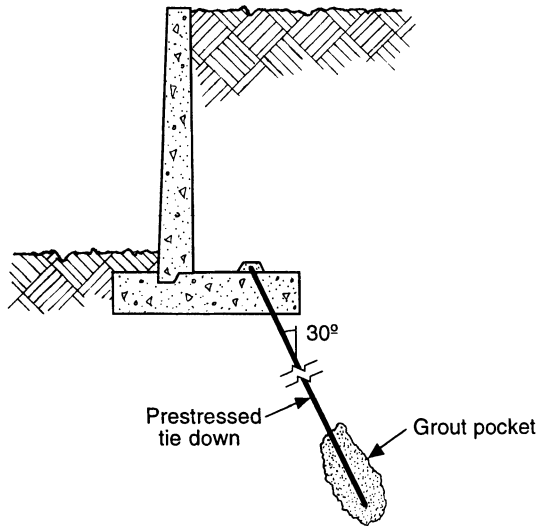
Example 11-9—Cantilever retaining wall stabilized by a post-tensioned tie-down system.
